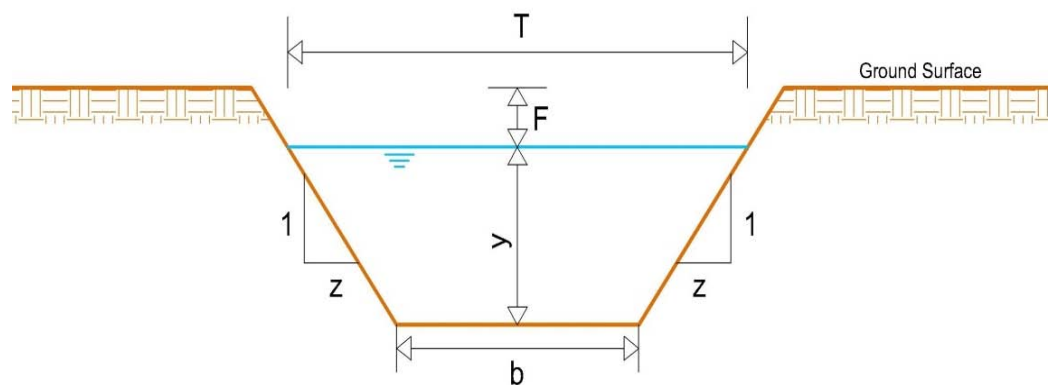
Top Width T in a Typical Trapezoidal Channel.
